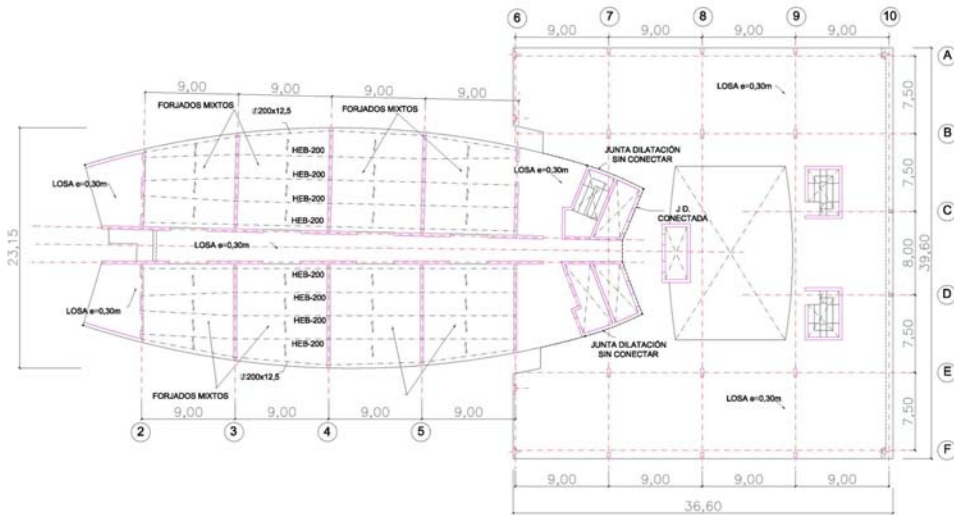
Typical plan view between level 1 and level 7 of the Tower and the Atrium
